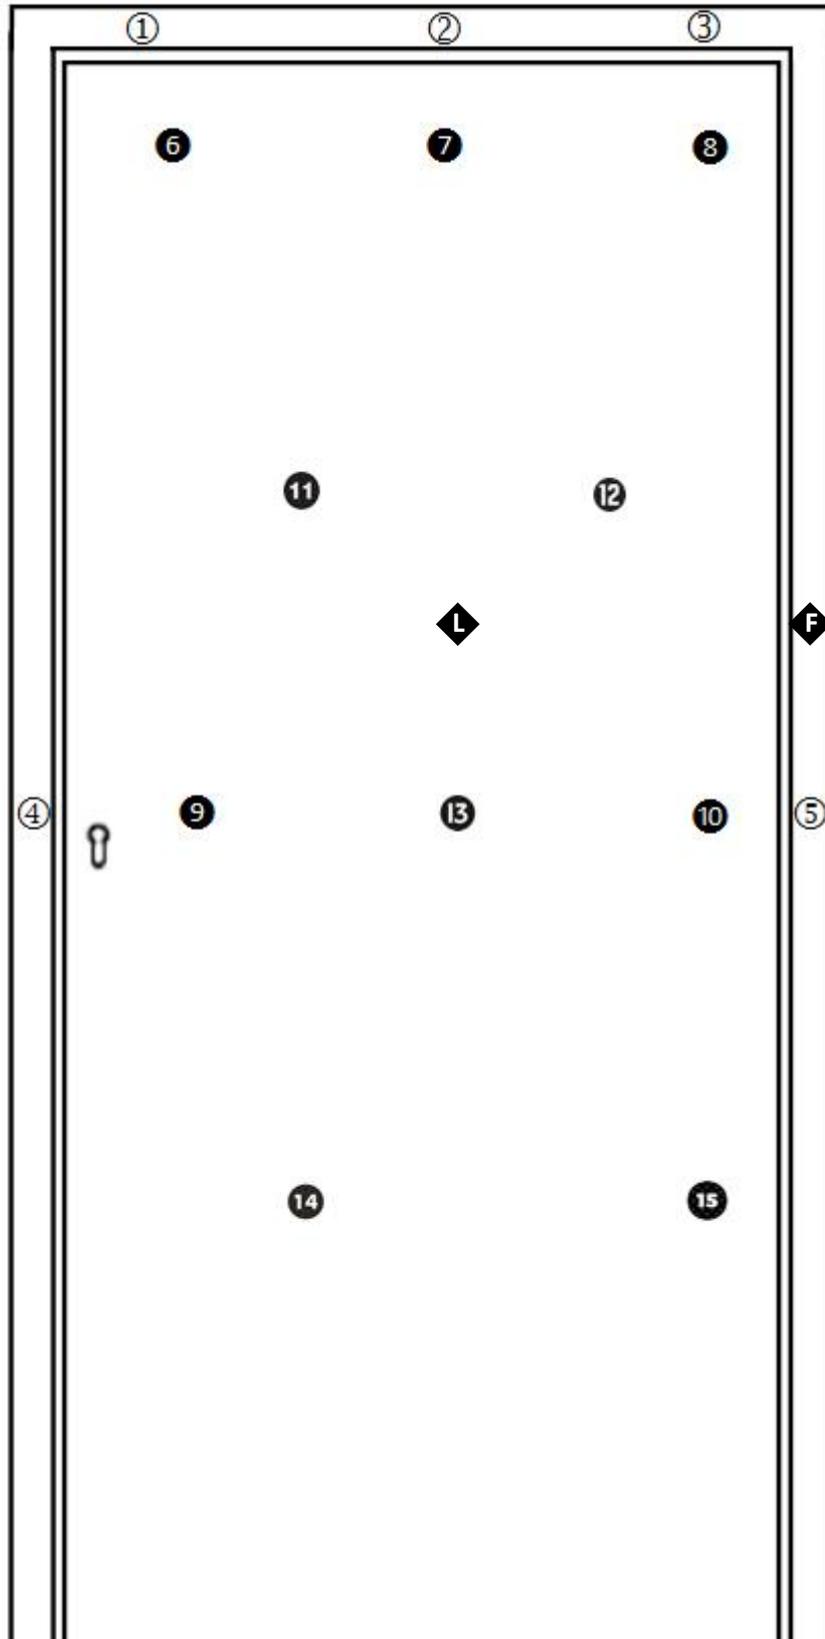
Layout of thermocouples on the unexposed surface of the test specimen
